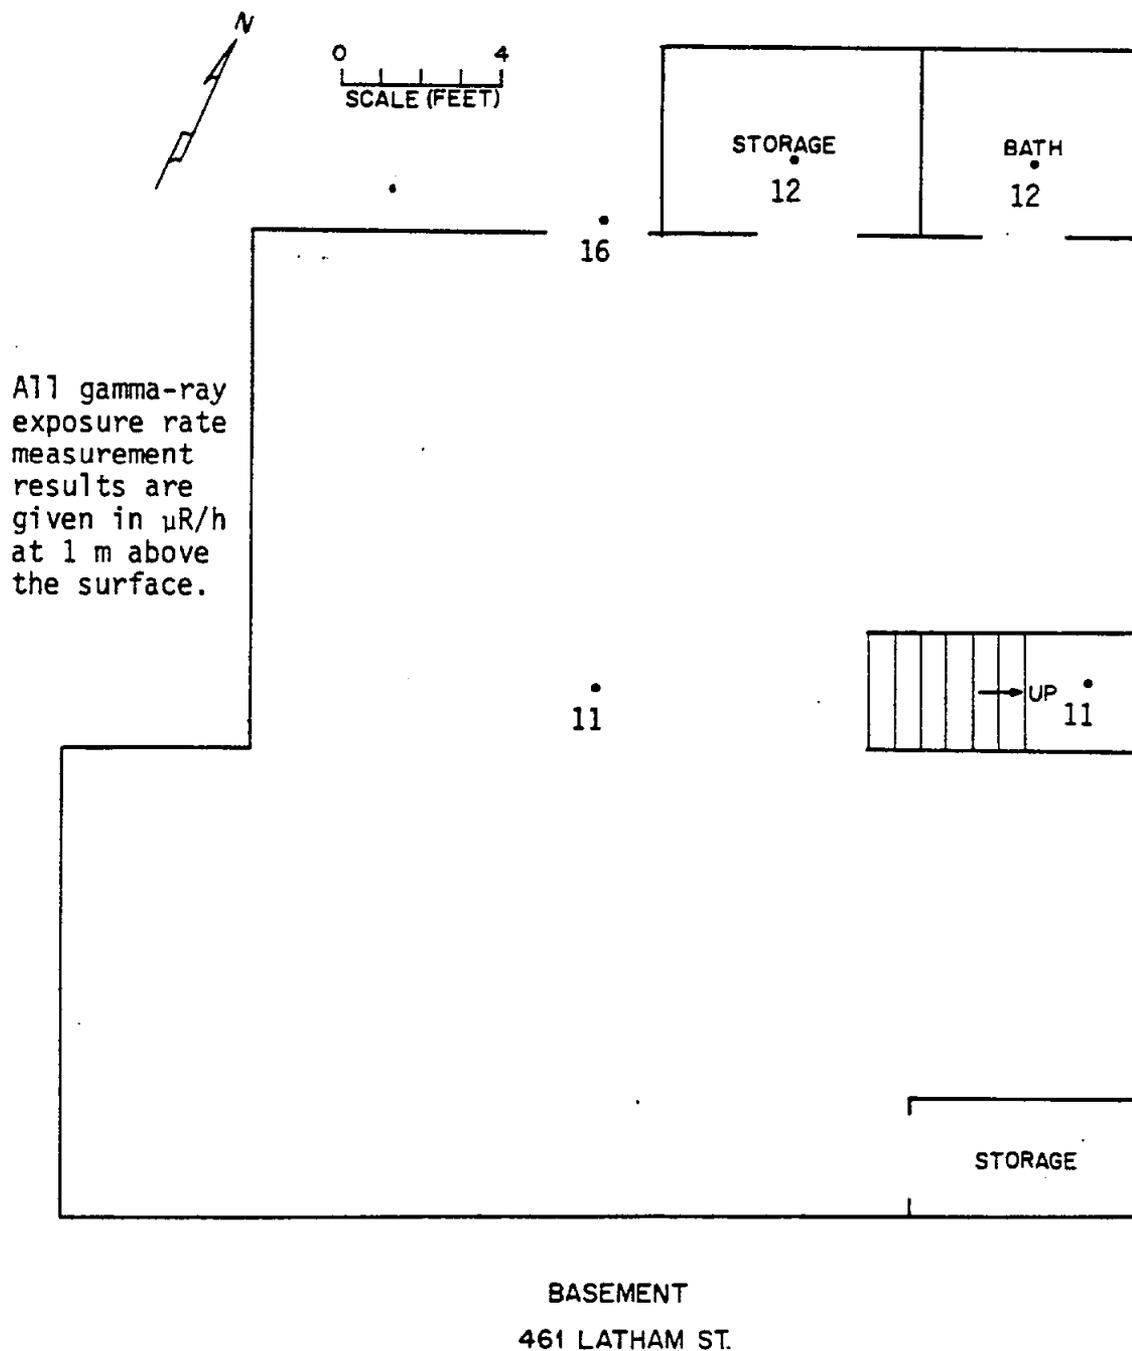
Schematic of the basement floor plan at 461 Latham Street
